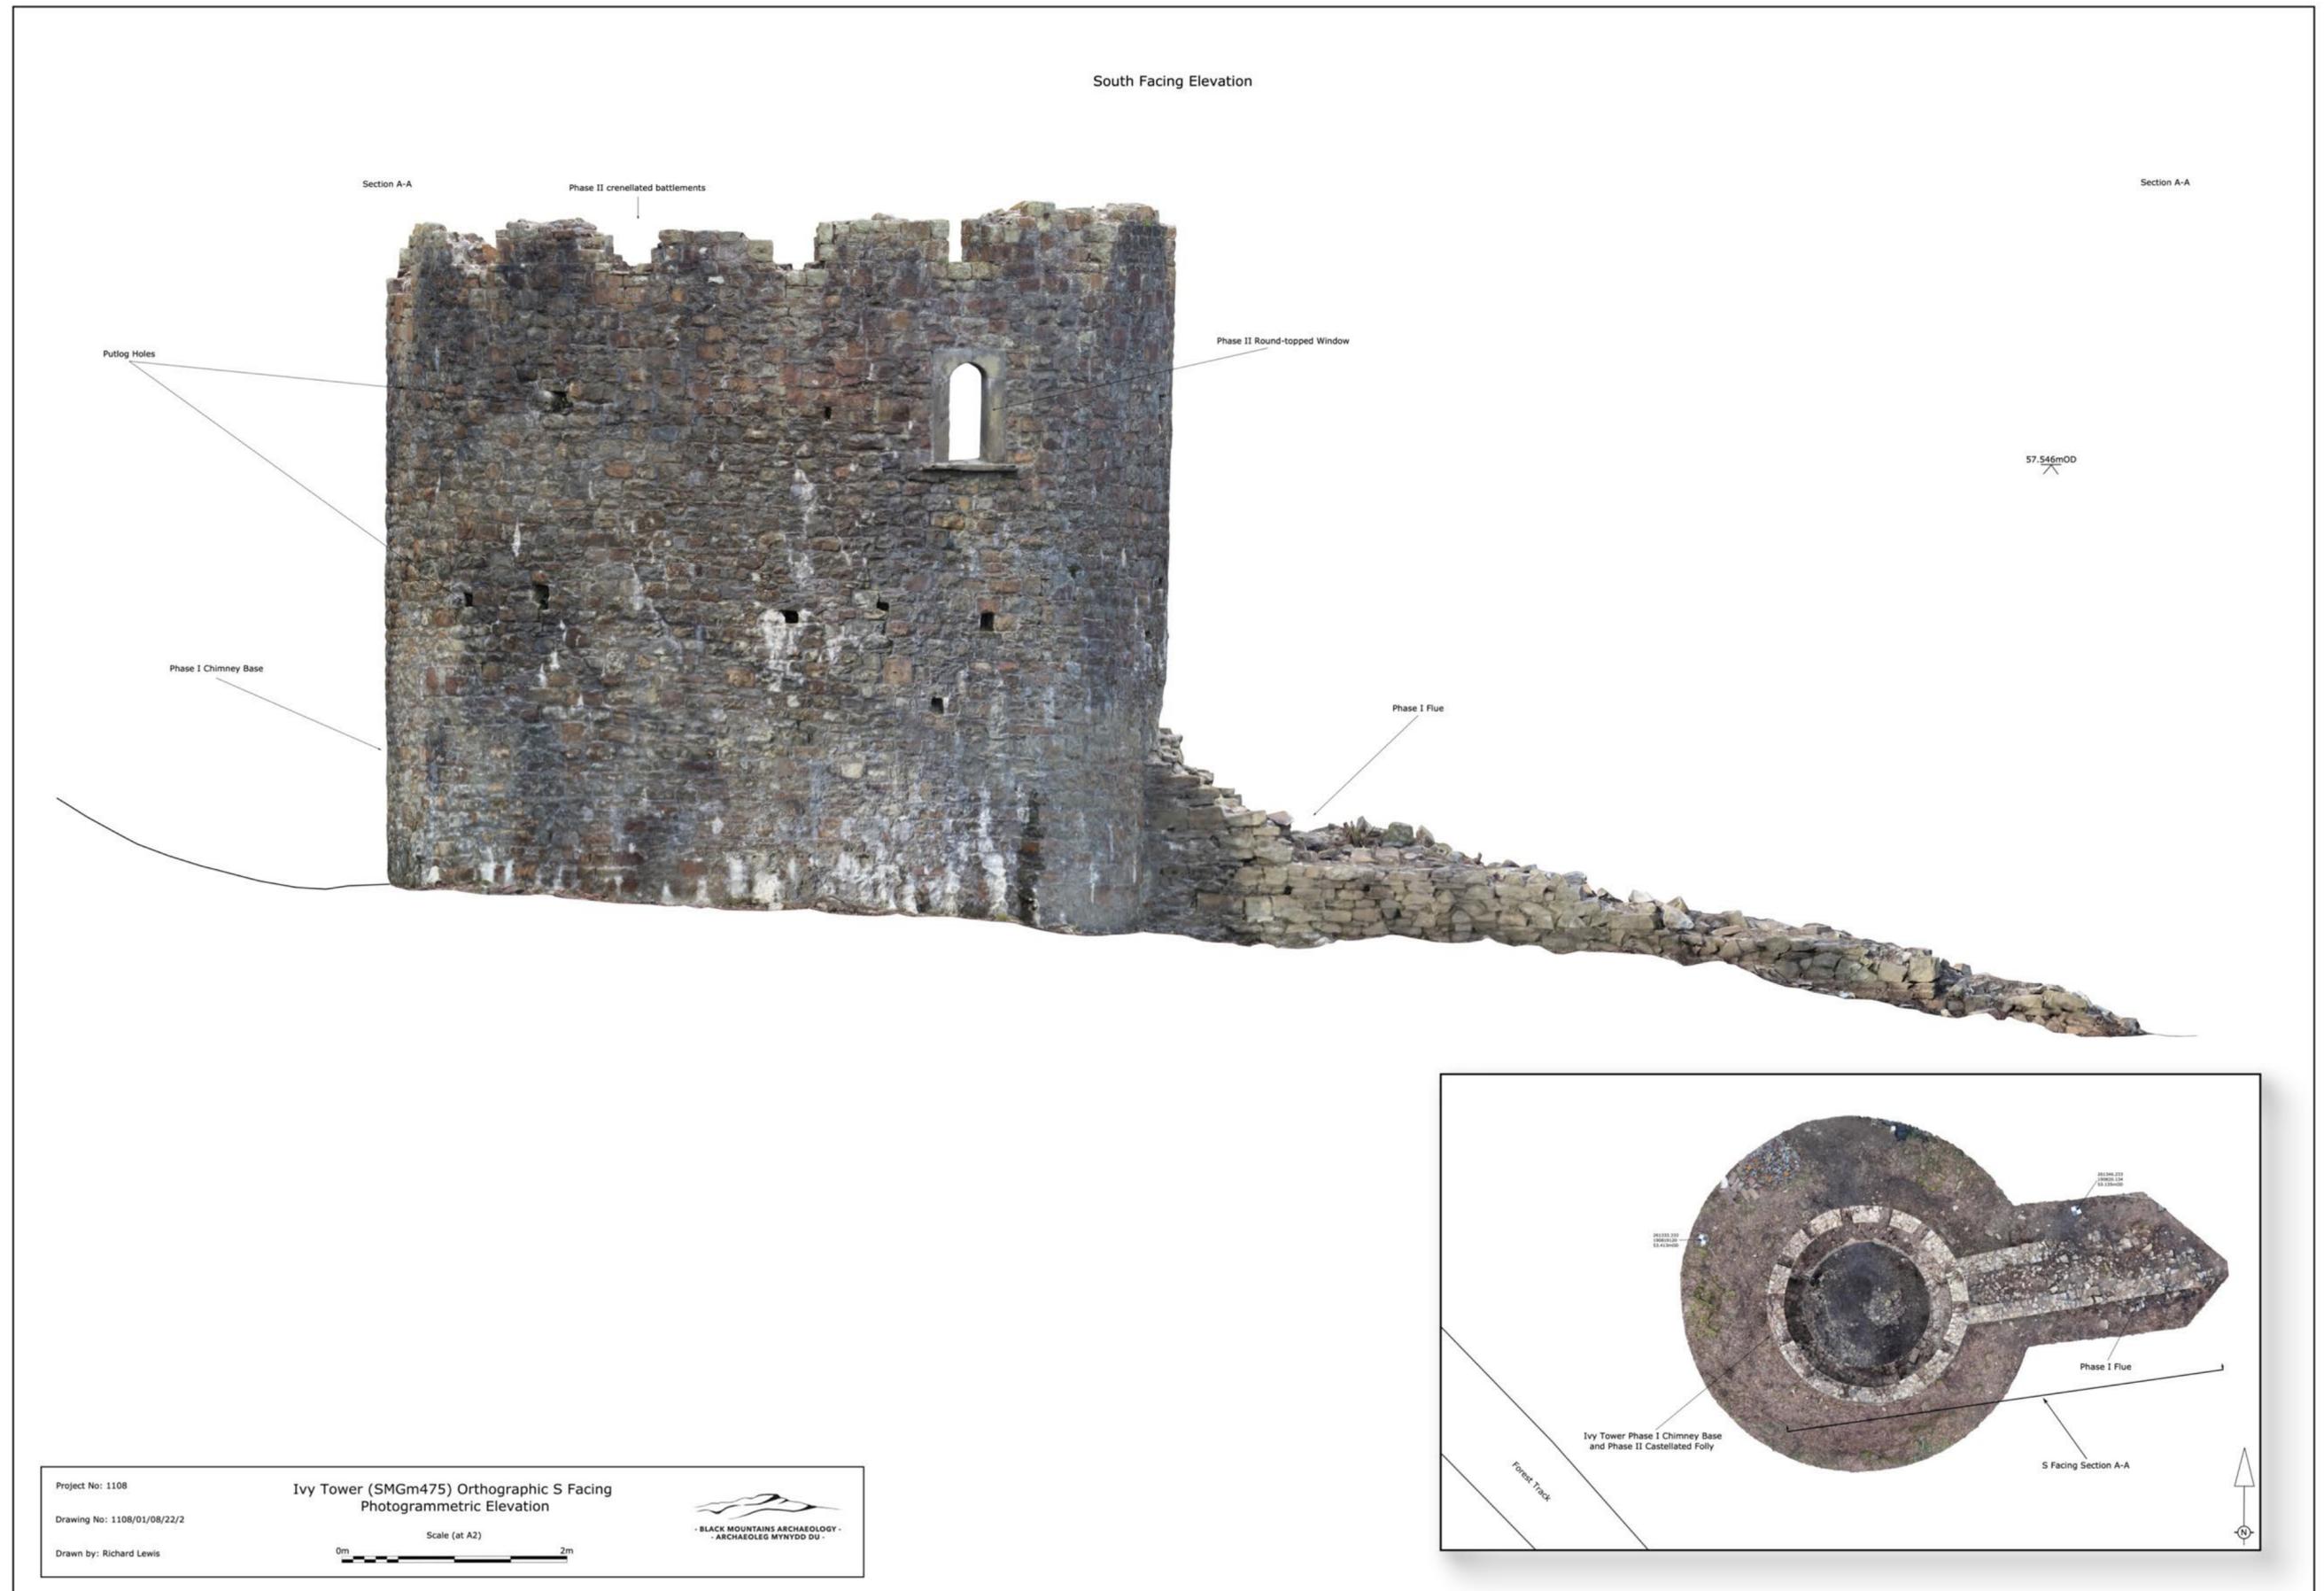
Ivy Tower Orthographic South Facing Photogrammetric Elevation.
